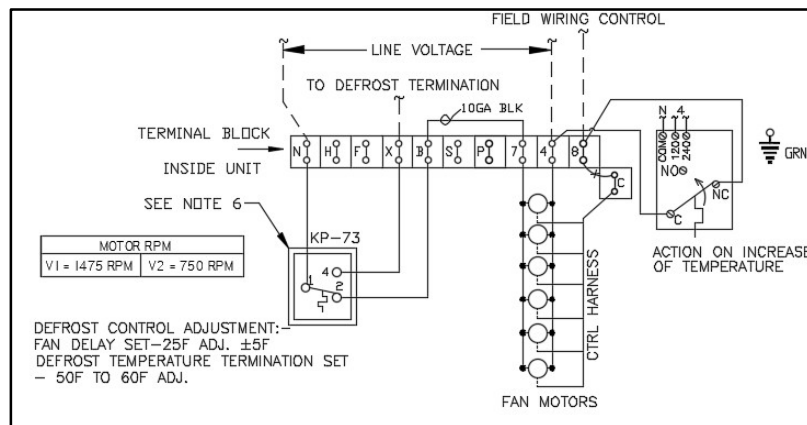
SETUP IN A SINGLE COMPRESSOR UNIT:
